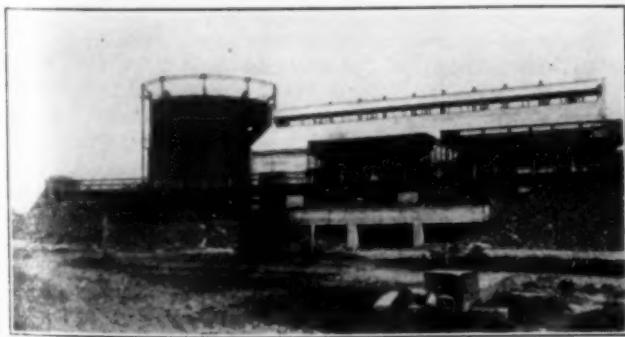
RETOUR HOUSE AND COAL-HANDLING ARRANGEMENT FOR THE RETOUR HOUSE
